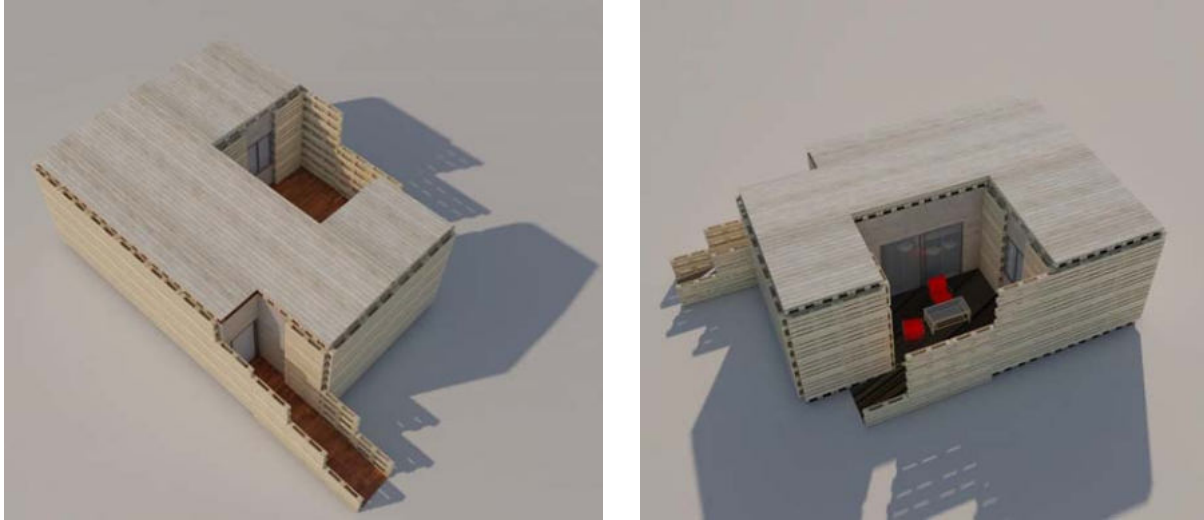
Pallet Shelter - External renderings<sup>22</sup>
